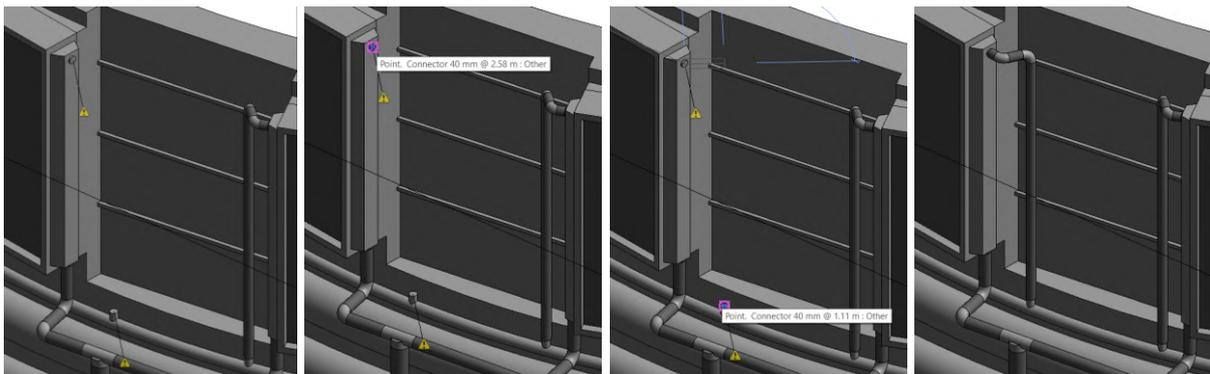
Drawing a pipe from the cooler connection point to the circular pipe ring connection point using MagiCAD.
